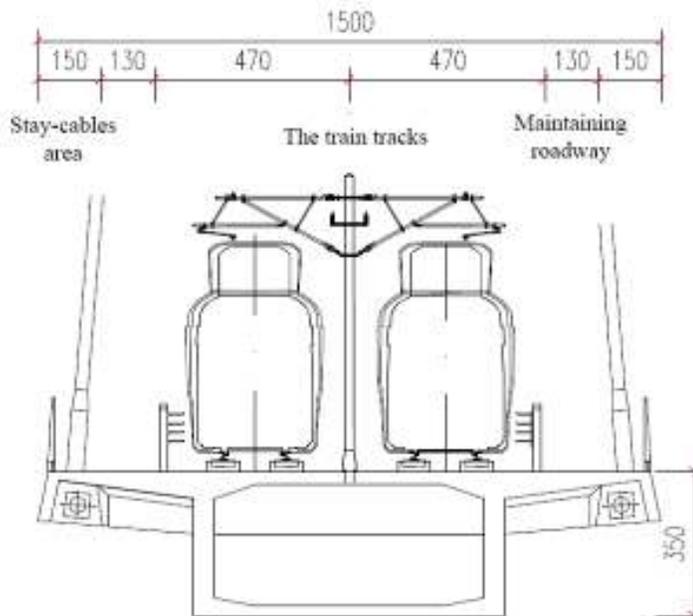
Cable-stayed bridge cross section diagram (unit: cm)
